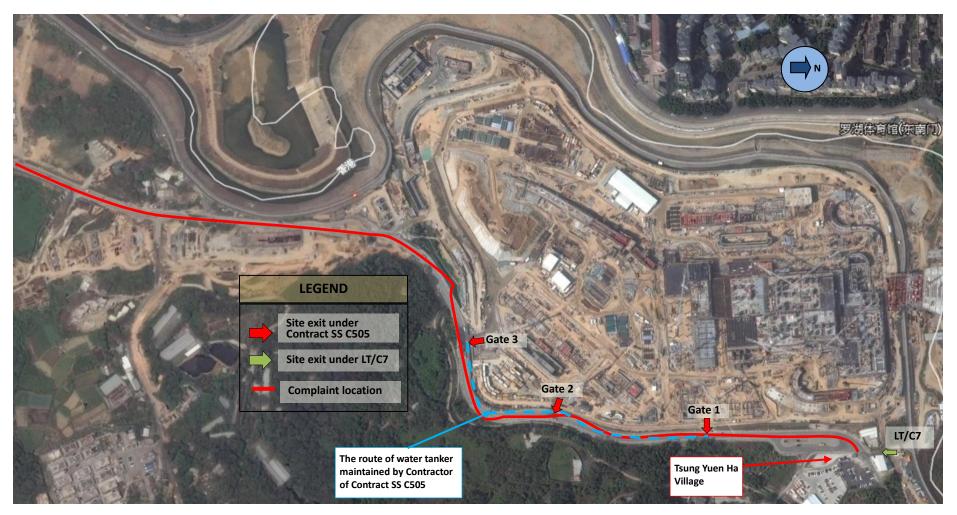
Location Plan for Site exits along Lin Ma Hang Road under Contract 7 and other Contract
